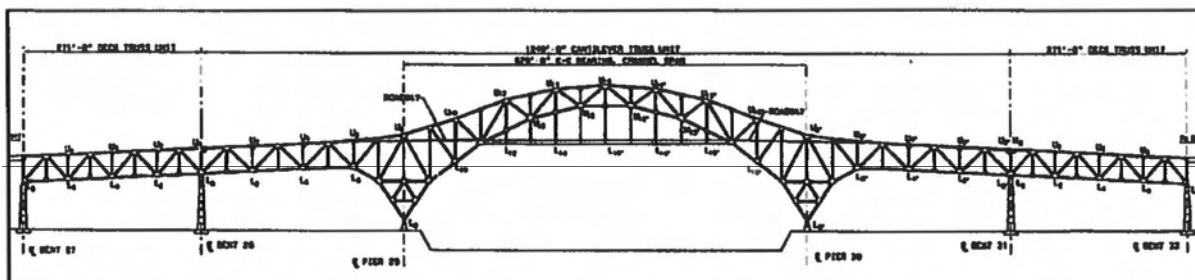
Elevation of Harbor Bridge truss spans, from 2010 rehabilitation project.
